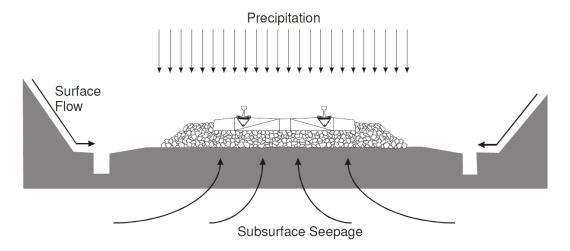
Typical drainage configuration and water sources (Ebersöhn & Gräbe, 2008b)
